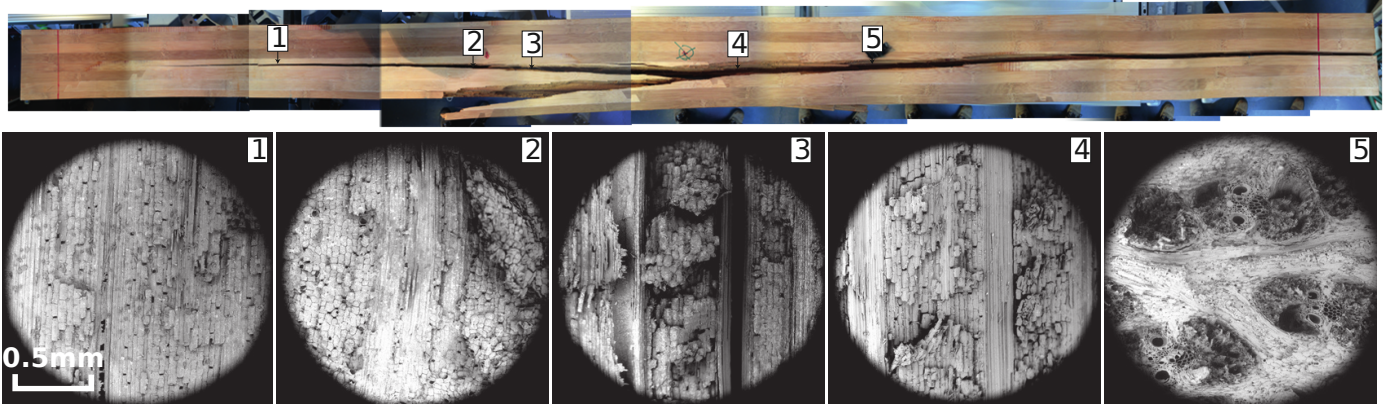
Fracture surfaces along the crack path in a beam tested to failure in four-point bending by Sharma et al. [1]
